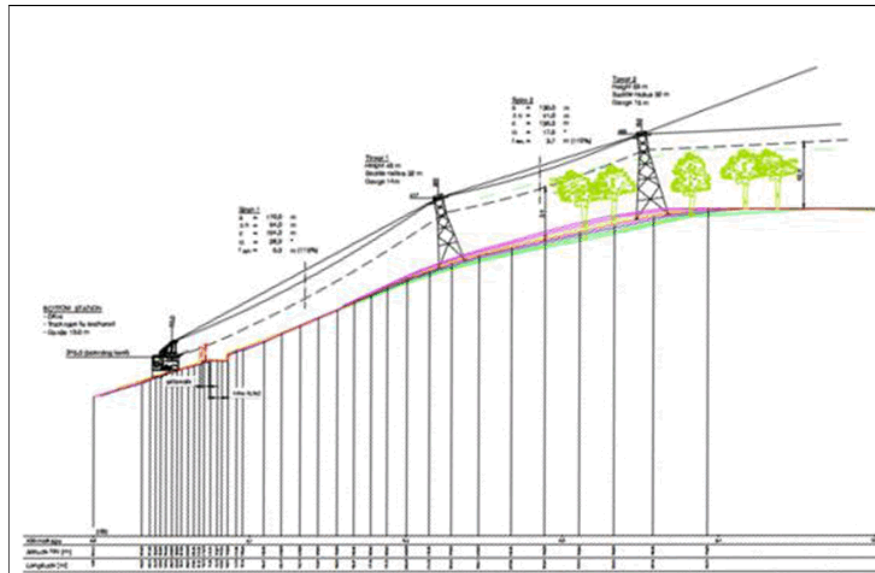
Conformation of aerial cables and canopy. Base Station to tower 2
